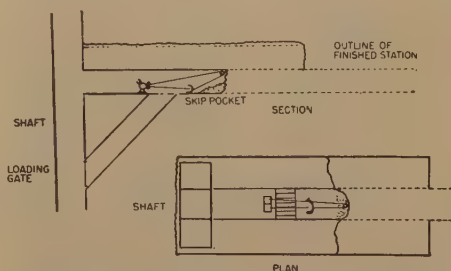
ENLARGING AND CUTTING STATION TO SKIP POCKET WITH SCRAPER HOIST AND SMALL PILOT HEADING.
